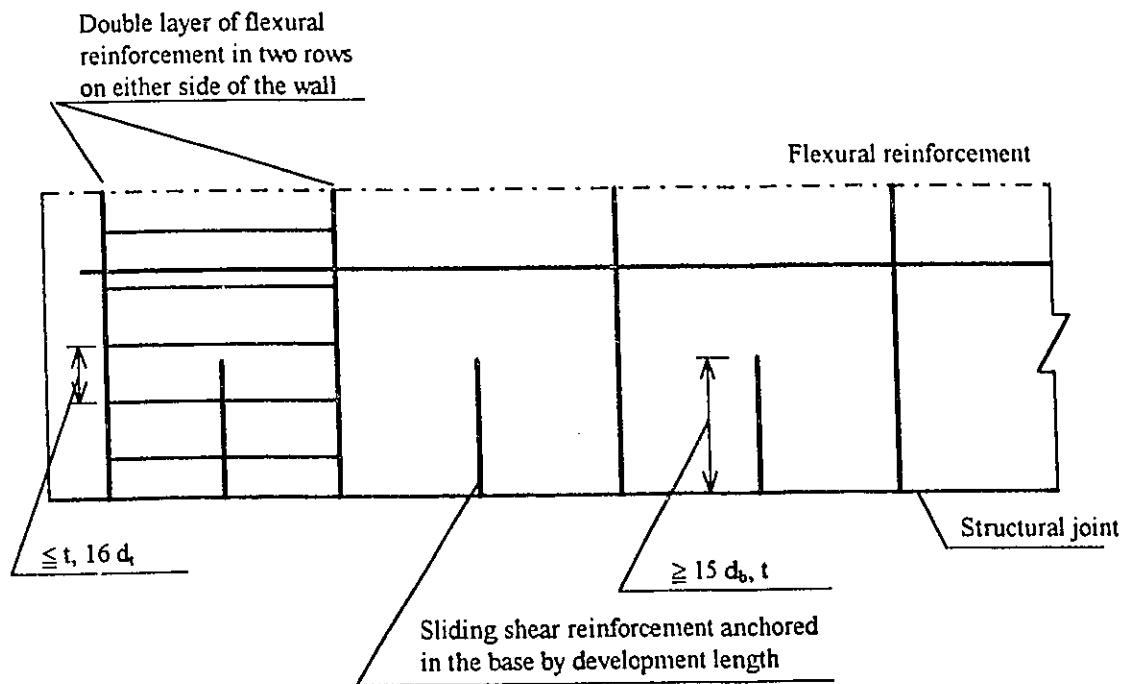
Details of the Sliding Shear Reinforcement (adopted from Wasiewicz, 1988)
